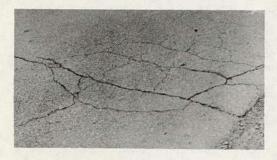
Section with cement-treated base showing considerable pavement deformation prior to cracking.
